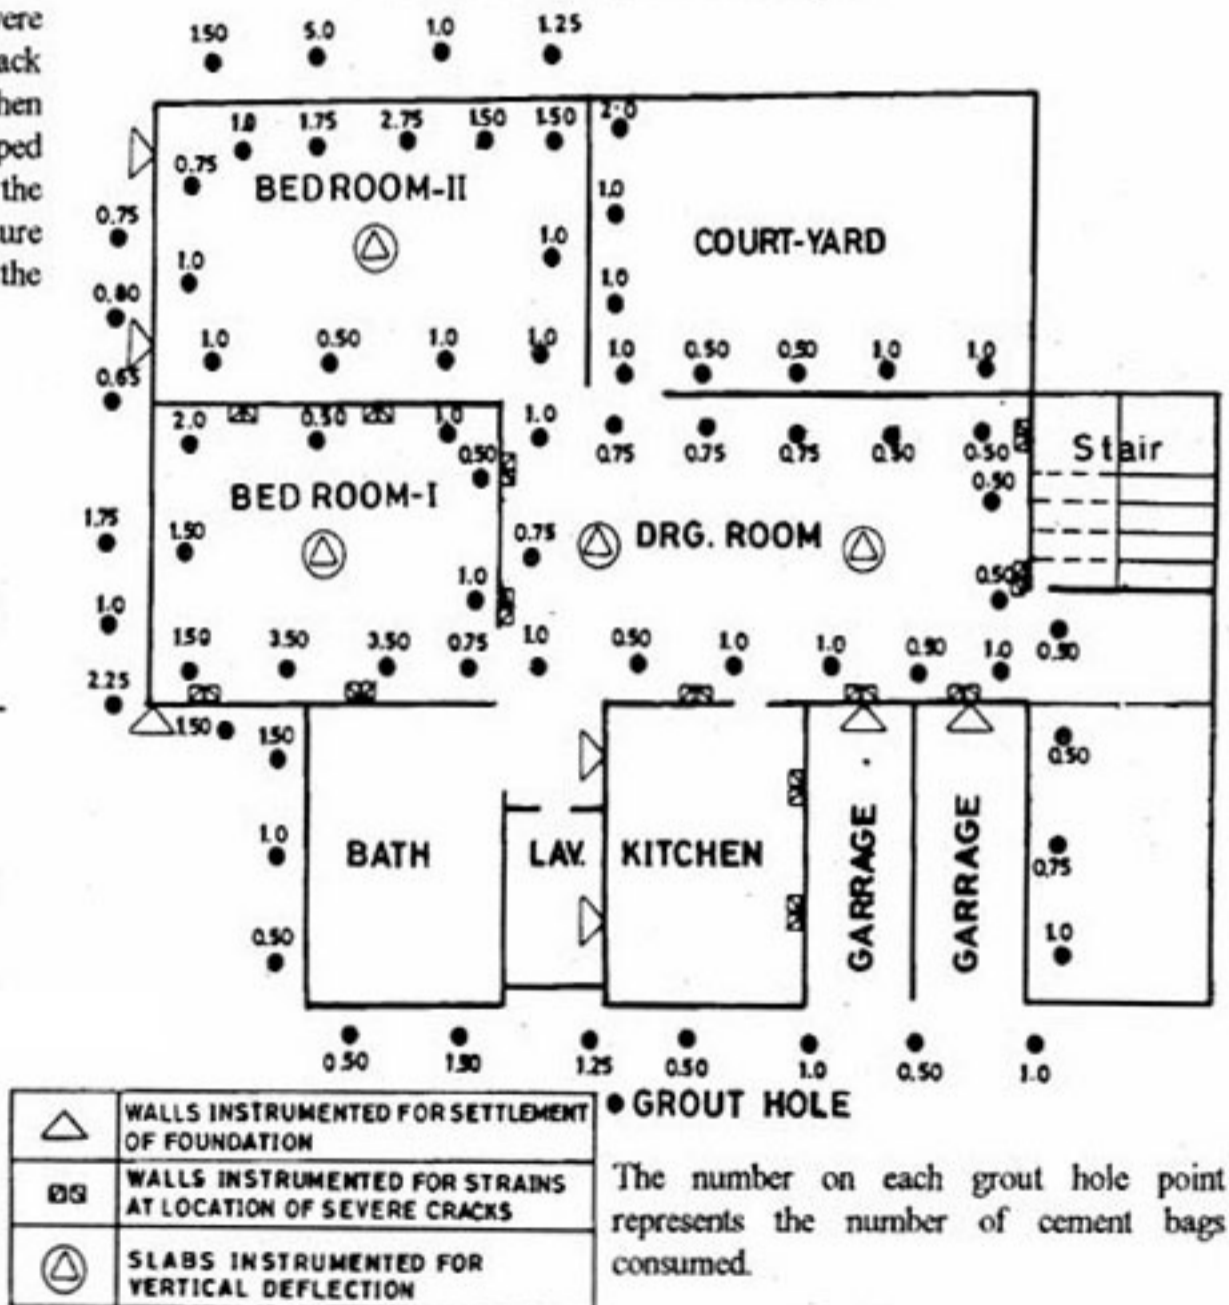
Ground floor layout plan showing grout hole points, grout intake and instrumentation
